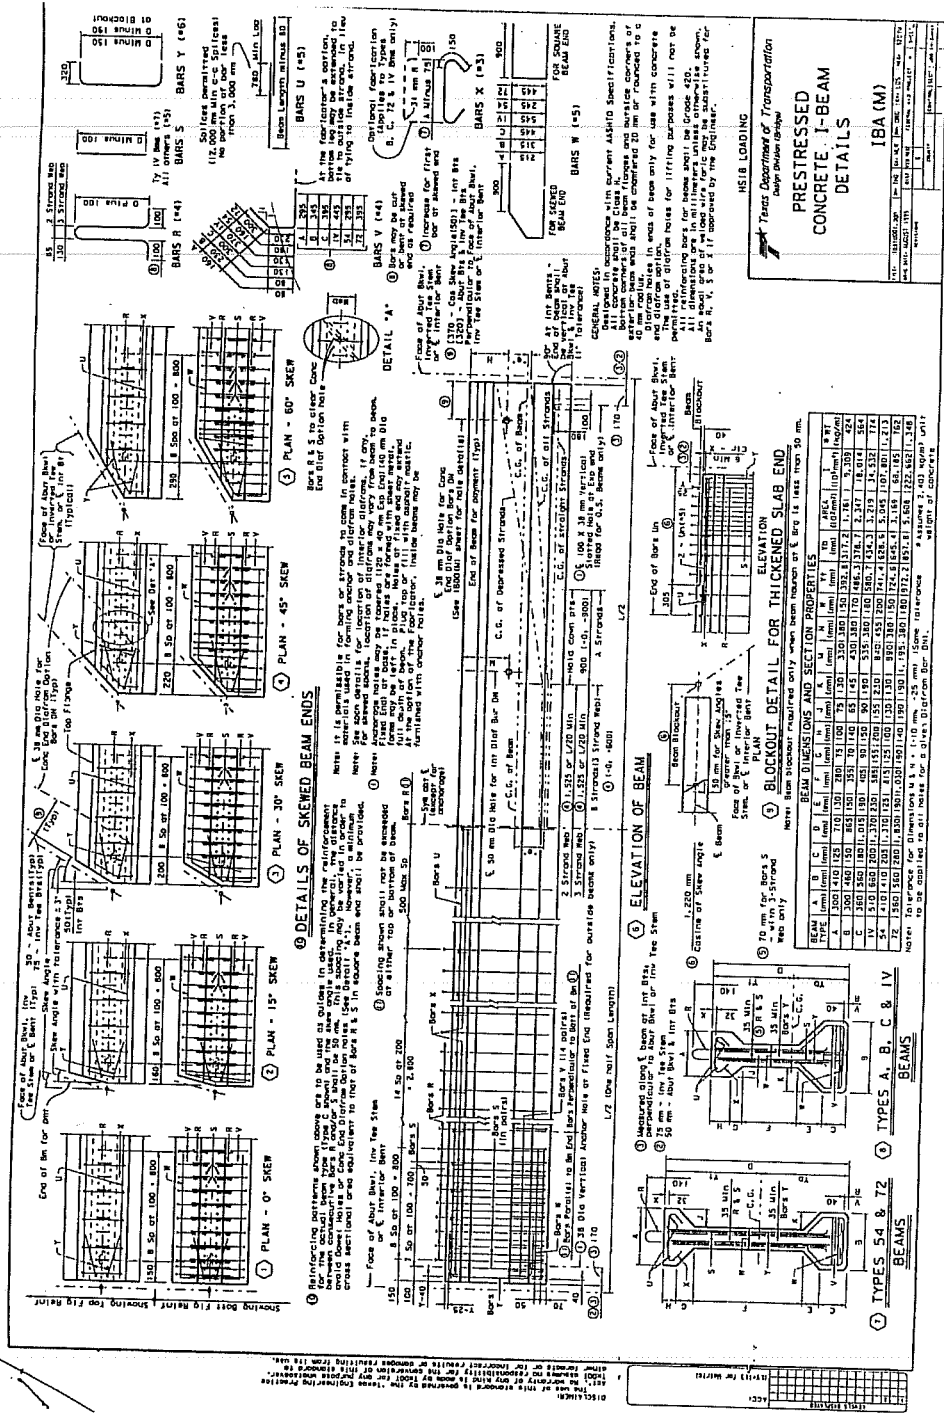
TxDOT Prestressed Concrete Beam Mild Steel Reinforcement Detail IBA (M)
